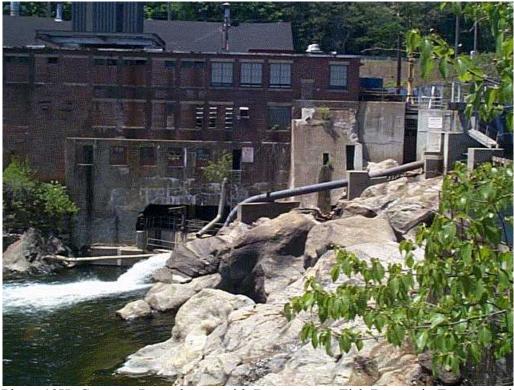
H: Crescent Powerhouse with Downstream Fish Bypass in Foreground
